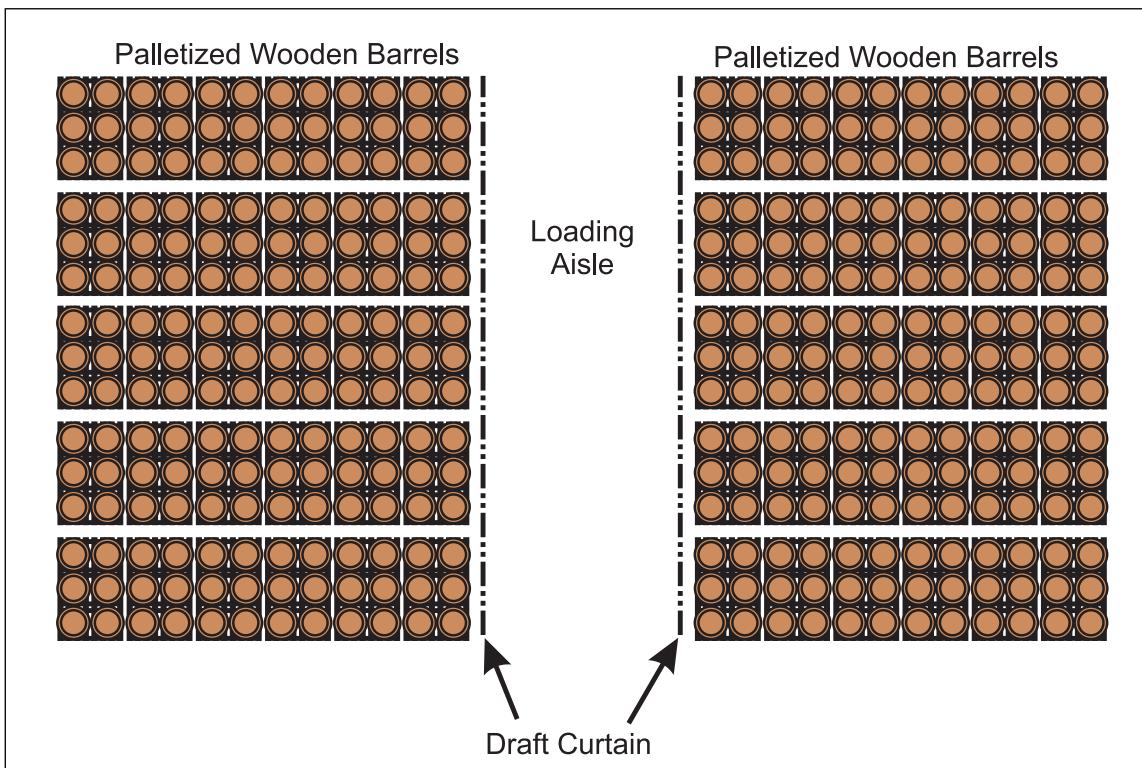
A. Loading aisle draft curtain arrangement (plan view)
